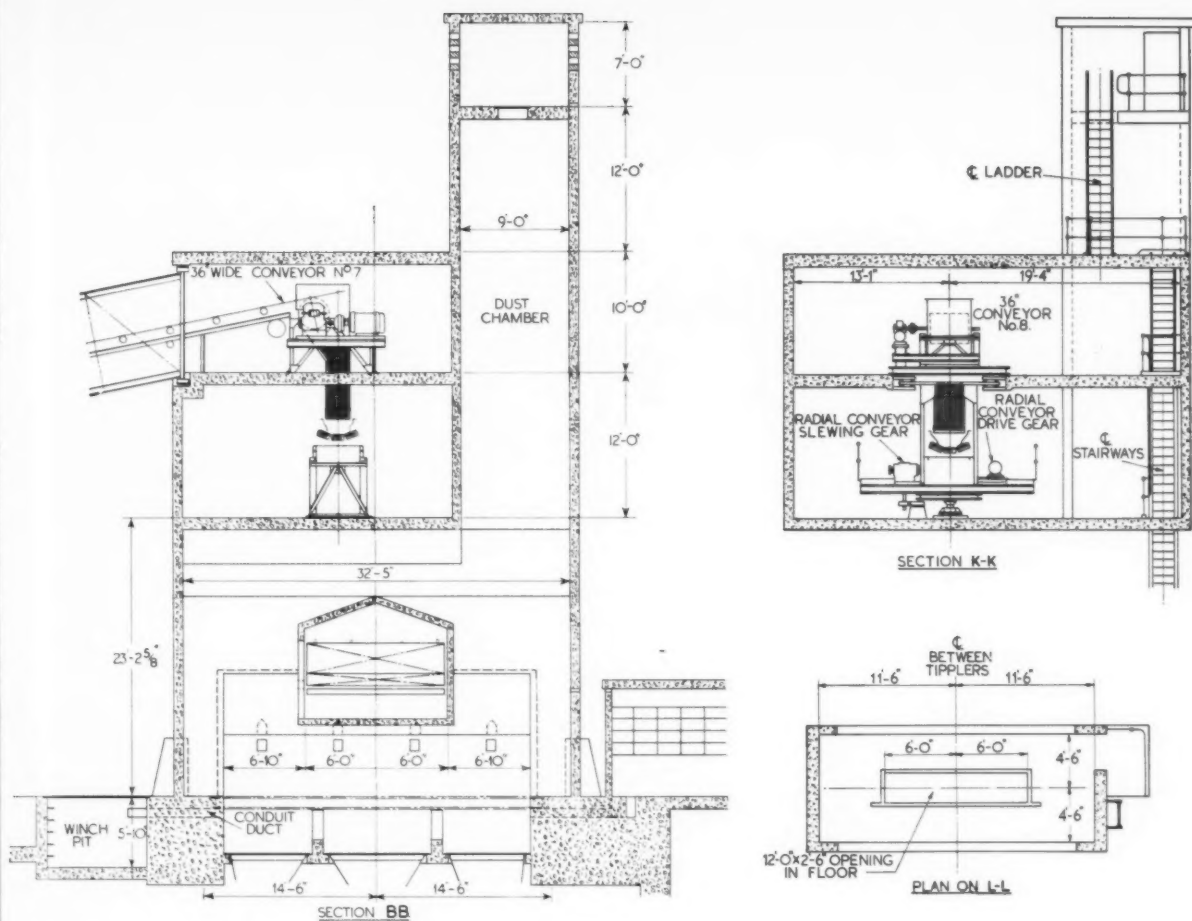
(above and on opposite page). Layout of tippler house, showing construction of stocking-out conveyor (No. 9 conveyor) and cross-section through tipplers Nos. 1 and 2
